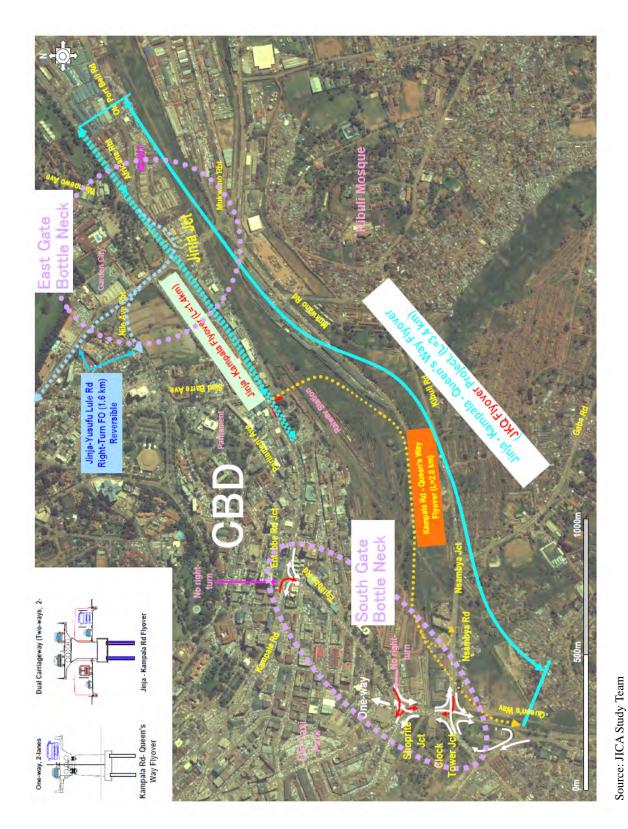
Plan of Jinja - Kampala - Queen's Way Flyover Plan
